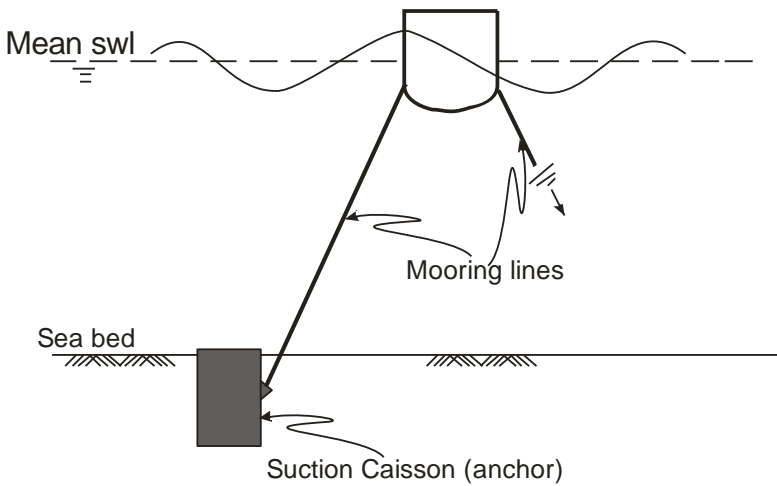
Suction Caisson as Anchor for Deepwater Floating Structures
